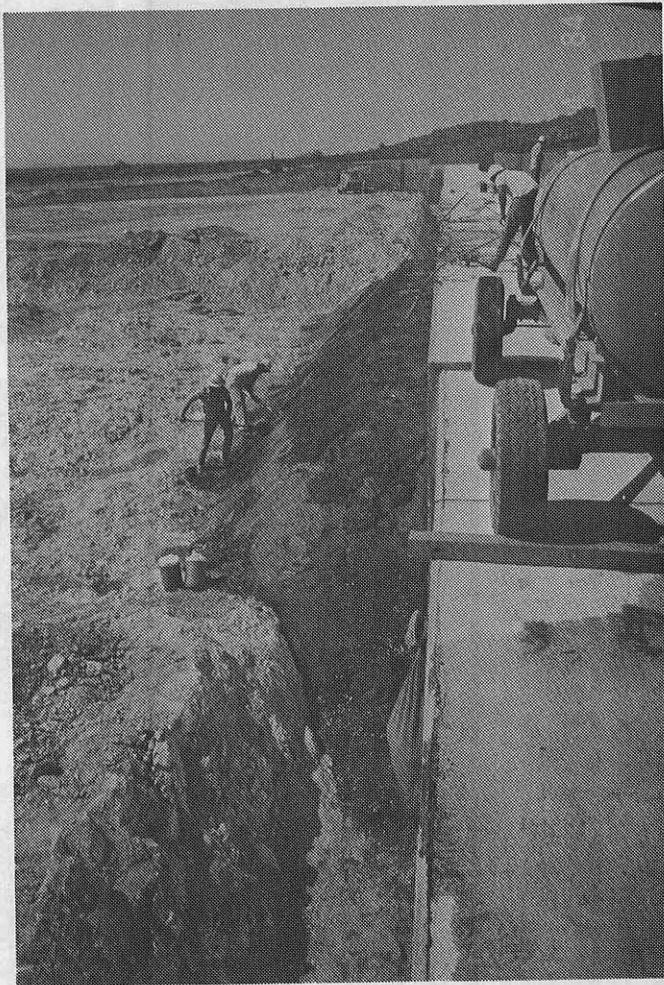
Concrete plug (fillet) on west side of outlet conduit. Note upper portion of plug is slightly steeper than 1:1 to eliminate "Feather" edges against the top of the conduit April 1984
